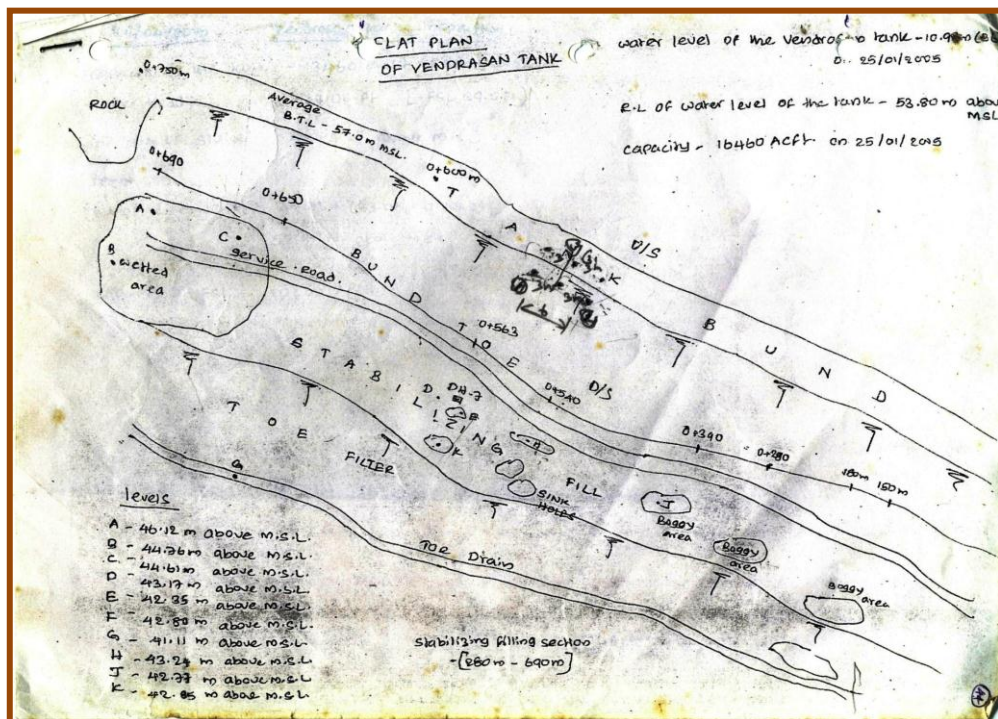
Flat plan of D/S of Vendrasan dam drawn in 2005
